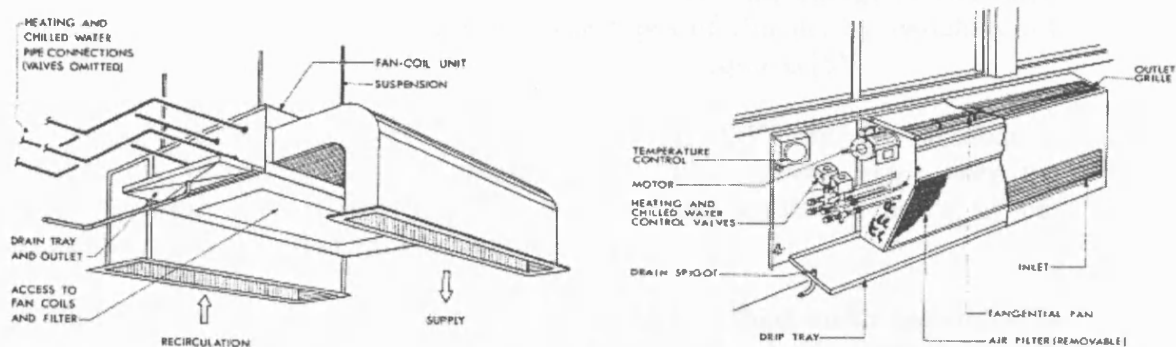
Fan coil units fitted above a suspended ceiling or under a window [1]
